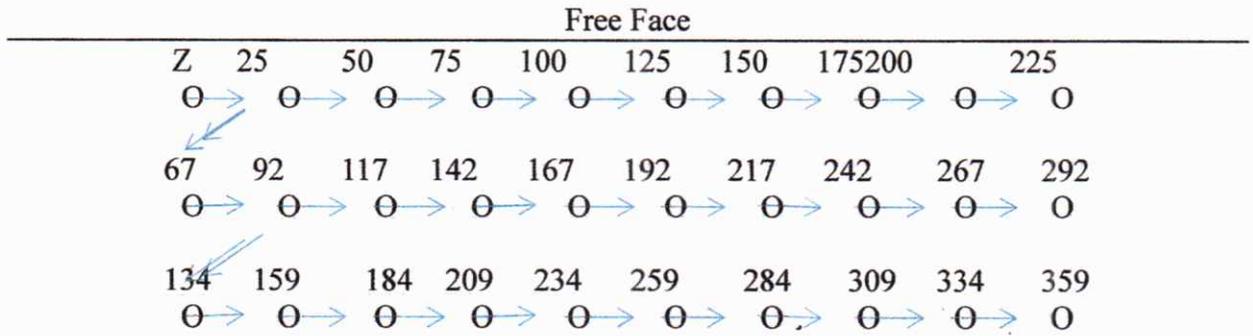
SUGGESTED BLAST LAYOUT -1
